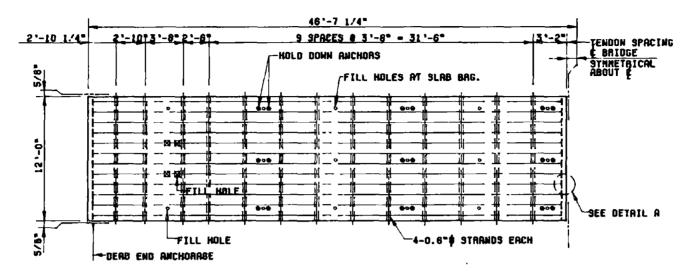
Elevation, Woodrow Wilson Memorial Bridge.
